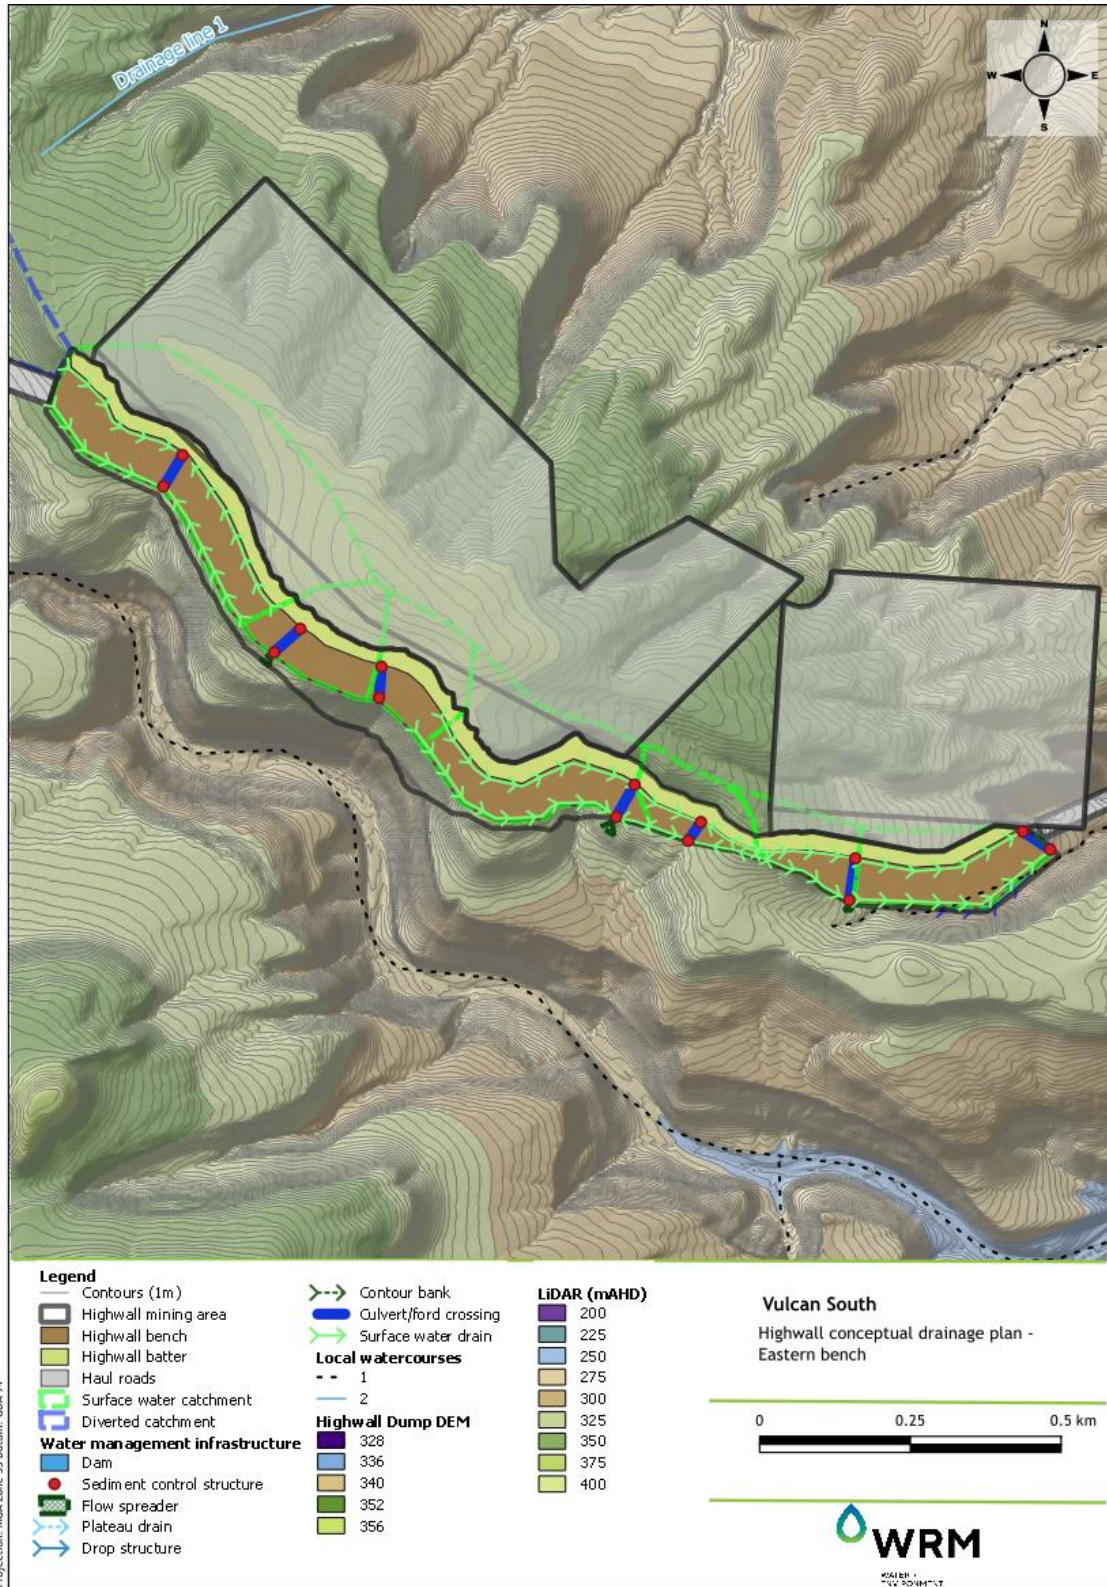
VS Highwall eastern bench mining area conceptual drainage plan
